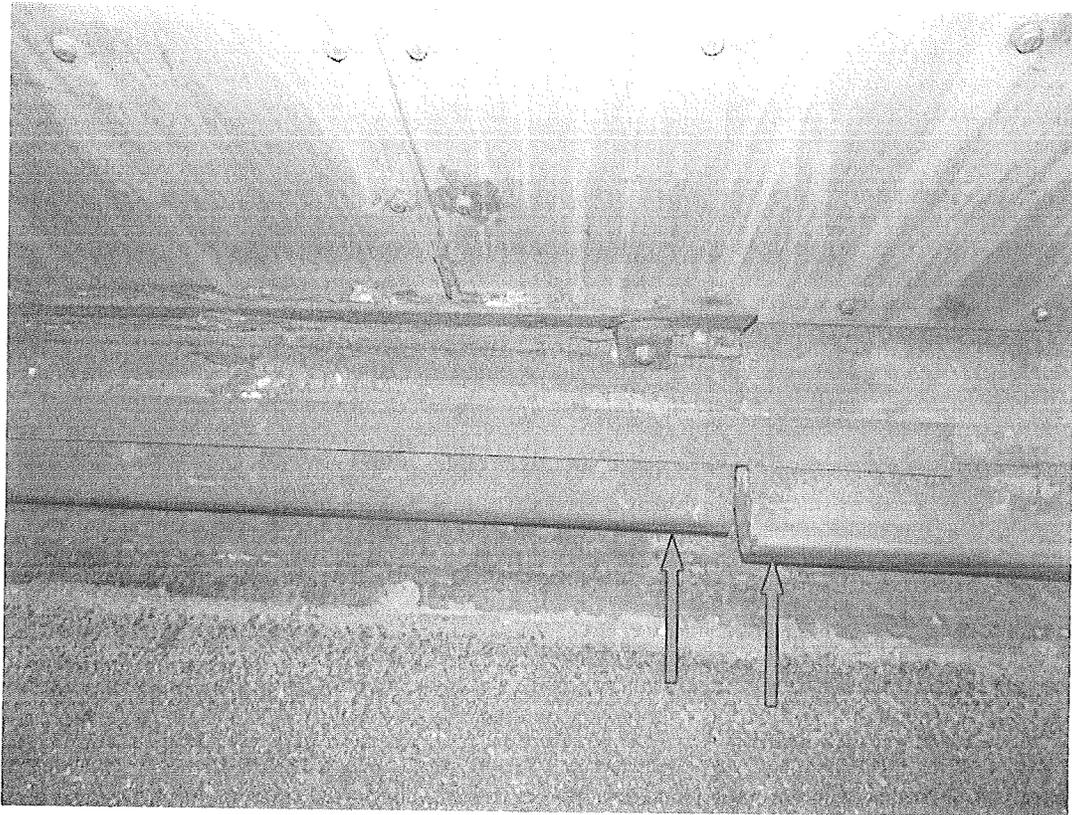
South Tunnel – Roadway – Station 83+55 – Approximate 1 ½" offset between unsecured curb section and adjacent curb.
